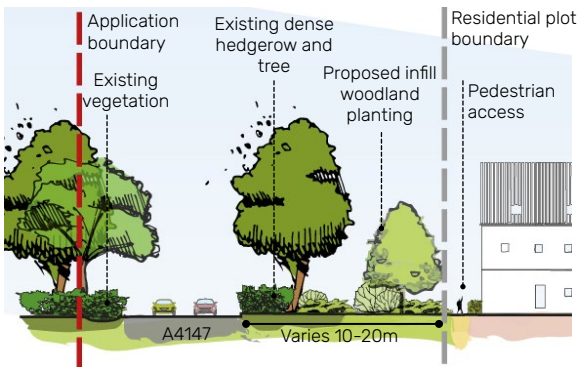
Section E-E A4147 Hemel Hempstead Road edge
